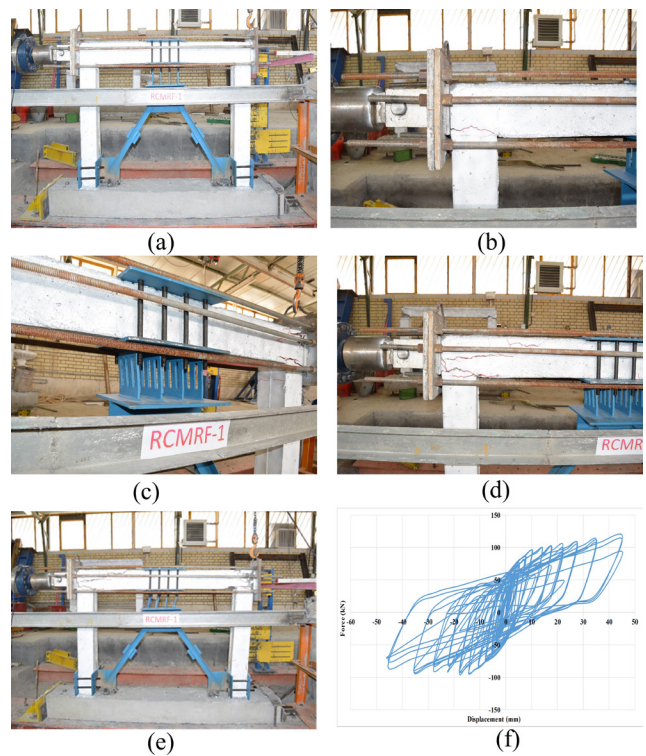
Results of the RCMRF-NSD experimental sample and test images during loading (a) at the beginning of test, (b) beam-to-column connection cracks at 0.5% drift, (c) yielding of NSD dampers at 1% drift, (d) wide cracks at the beam connection to the column in the drift of 3.5%, (e) the end of loading, (f) the hysteresis diagram of the sample
